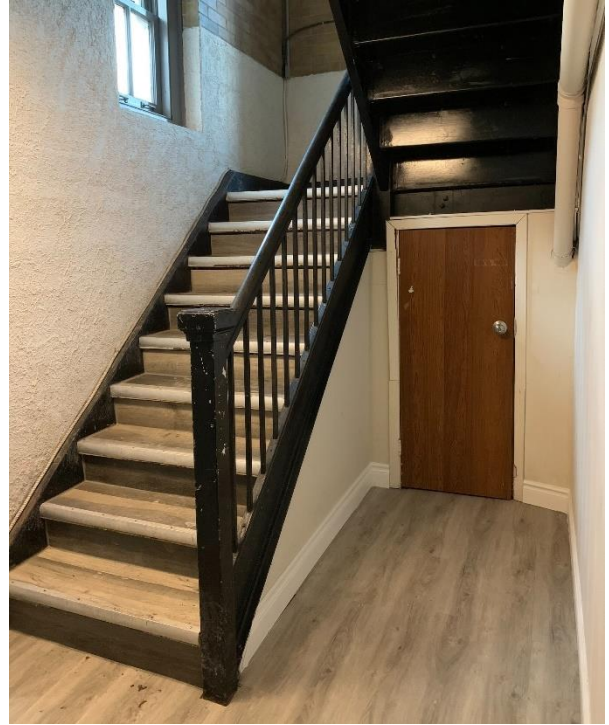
Looking towards the rear staircase at the northwest corner of the first floor (Town of Halton Hills 2022)
